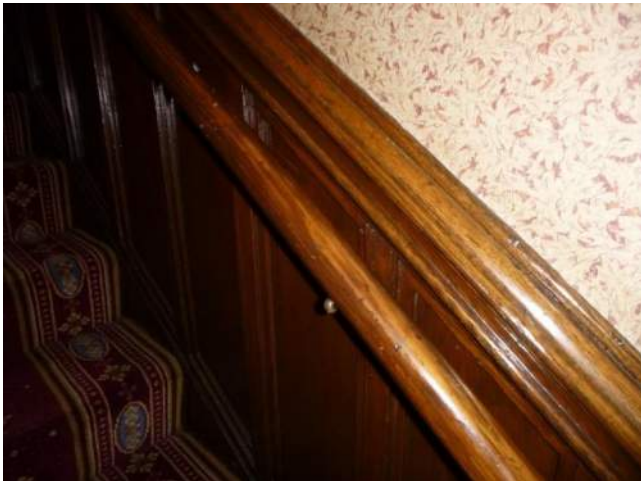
View of typical condition of wood wainscoting and decorative wall coverings at a second floor stair.
